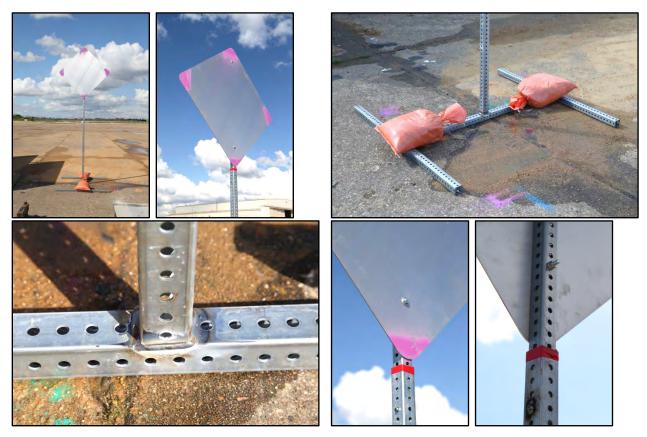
Option C Temporary Work Zone Sign Support Used for Test No. 490026-2-7.
